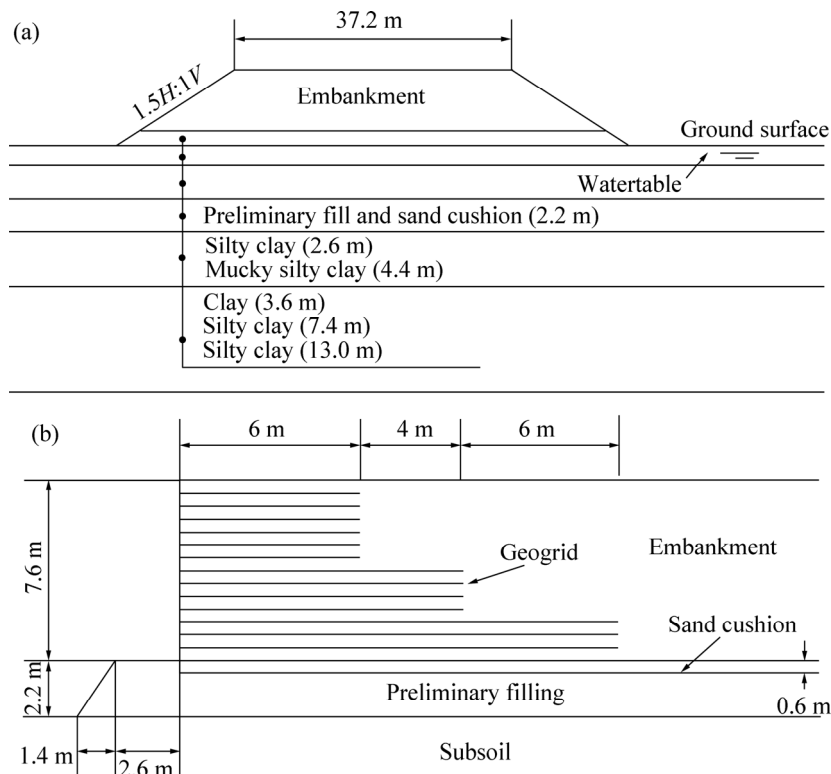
Geometry of road and reinforced wall at Shanghai Botanic Garden: (a) Cross section of road embankment; (b) Geometry and geogrid layout of reinforced wall
